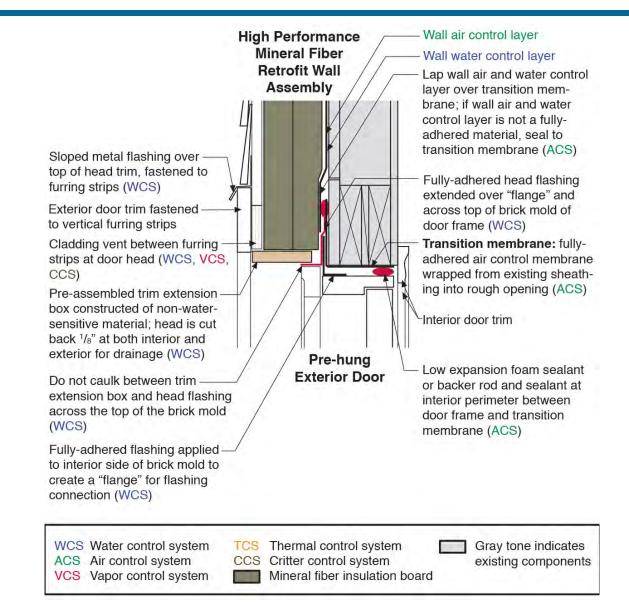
Schematic detail for door head of new door or reinstalled door in a high performance mineral fiber retrofit wall assembly
